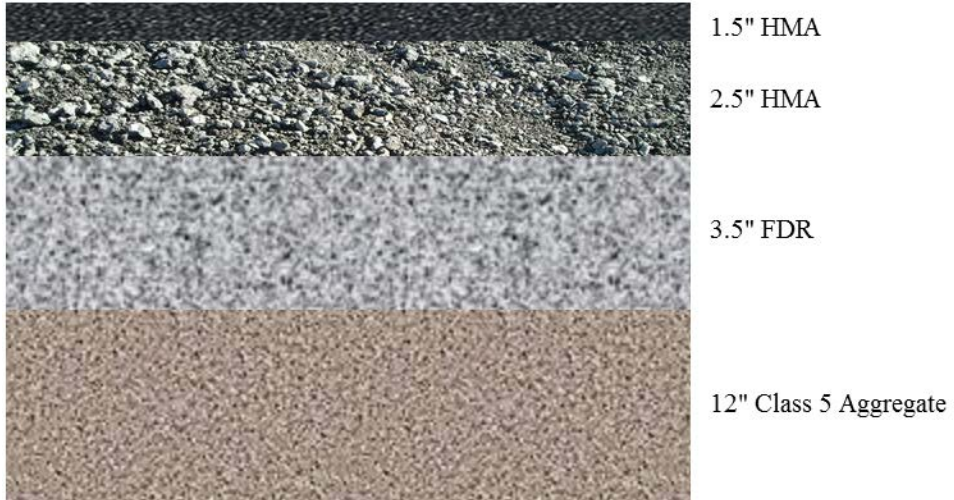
Pavement structure for Goodhue County CSAH 7 Section I
